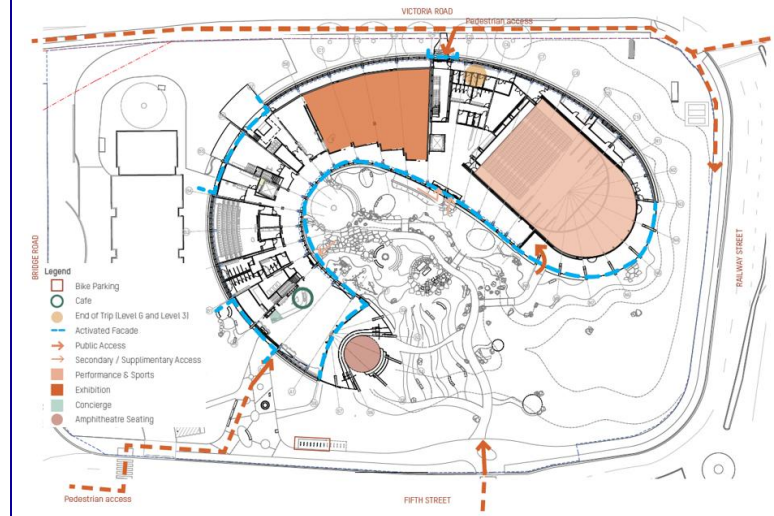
Figure demonstrating proposed entry points and activated facades of the building.
